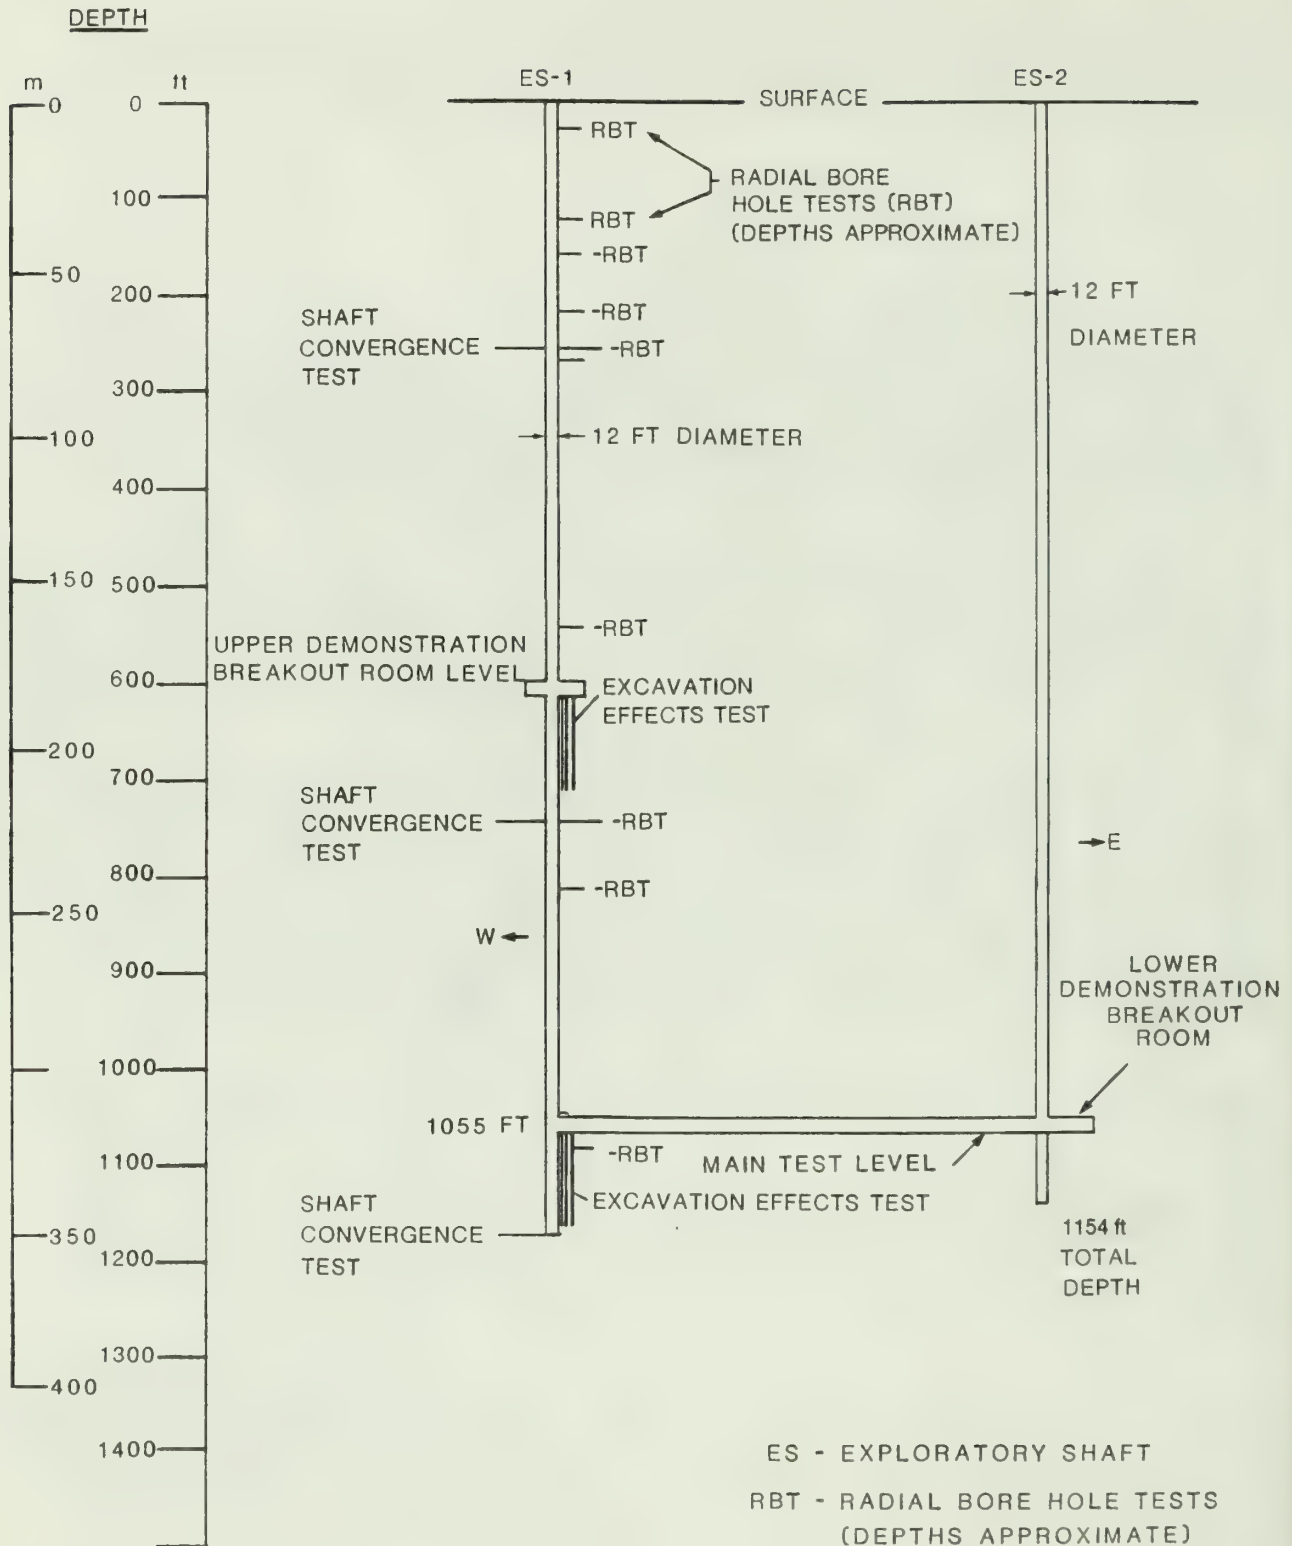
Schematic cross-section of exploratory shafts 1 and 2.
